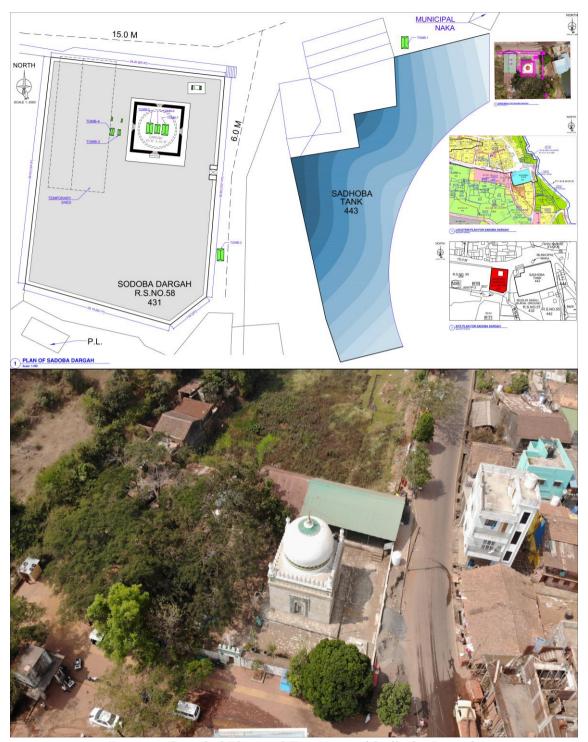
Detailed Plan and Top View of Sadhoba Dargah
